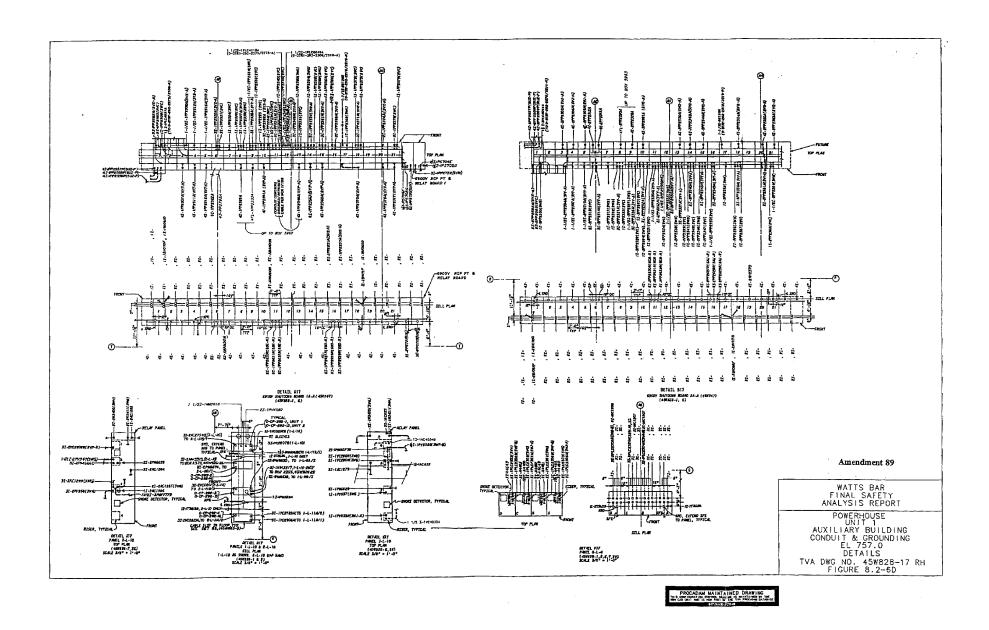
Powerhouse Auxiliary Building - Unit 1 Conduit and Grounding EL. 757.0 Details
